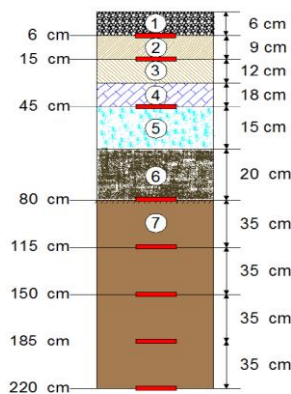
Scheme for location of sensors in pavement structure and subgrade for section with asphalt concrete pavement of “Astana-Burabai” highway: 1...6- numbers of pavement layers, 7-subgrade, ■-temperature and moisture sensors
